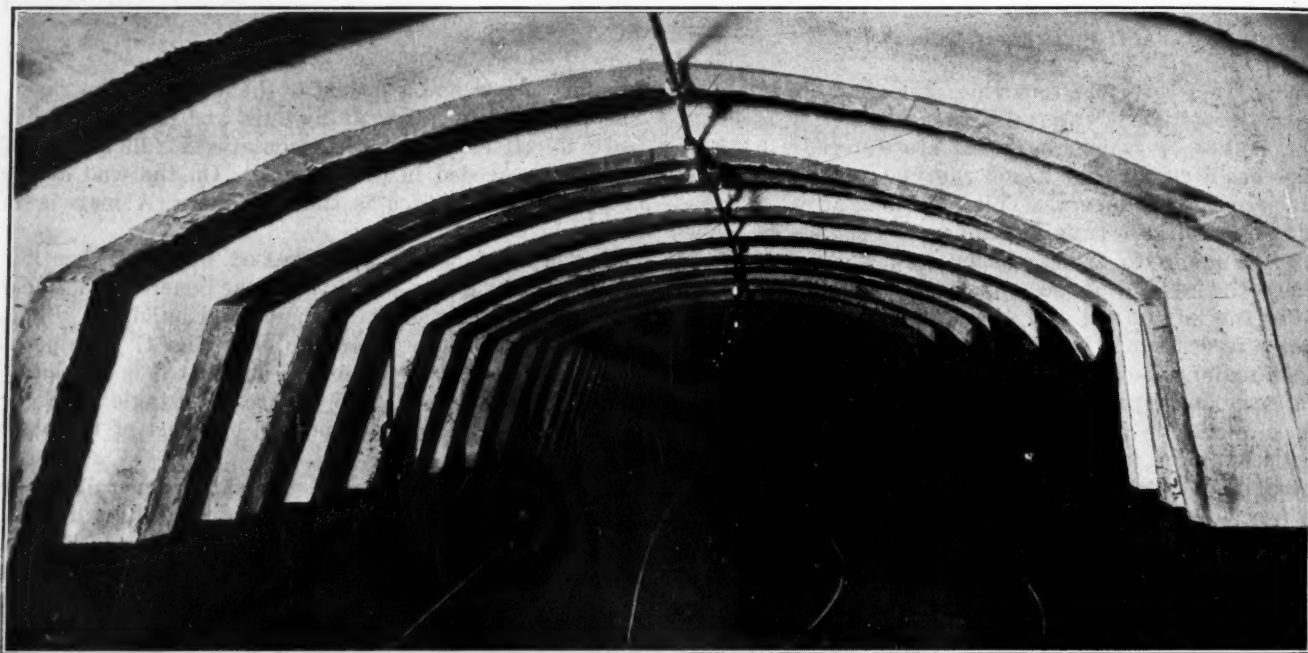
CONCRETE CONSTRUCTION ON HEADING ON BOTTOM LIFT
